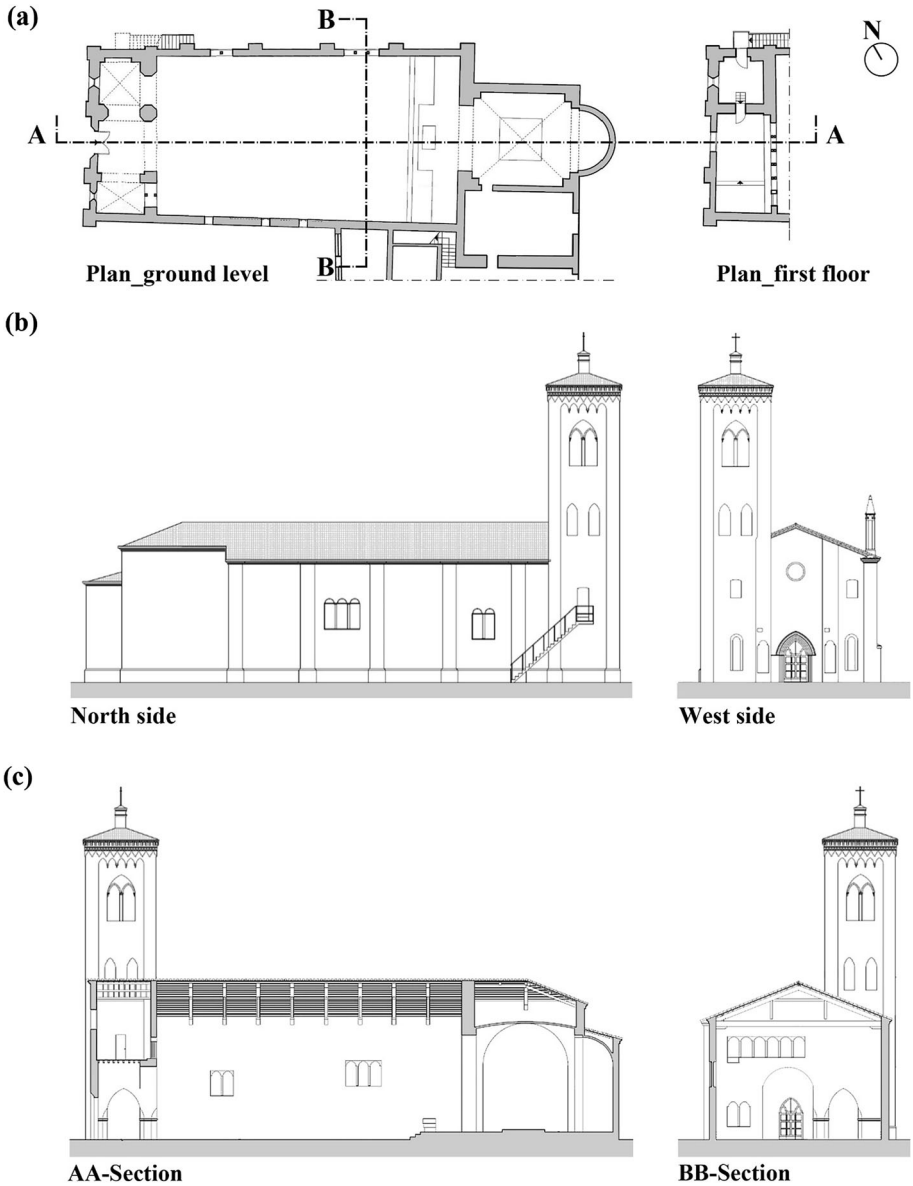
Santa Maria Assunta church: a plan, b elevation views, c sections
